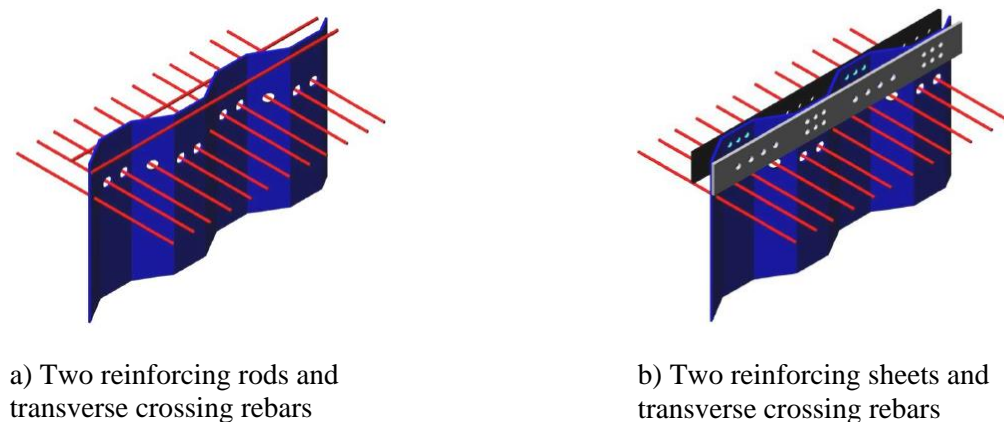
Compound joints with embedded corrugated steel web in concrete [16] p.143
